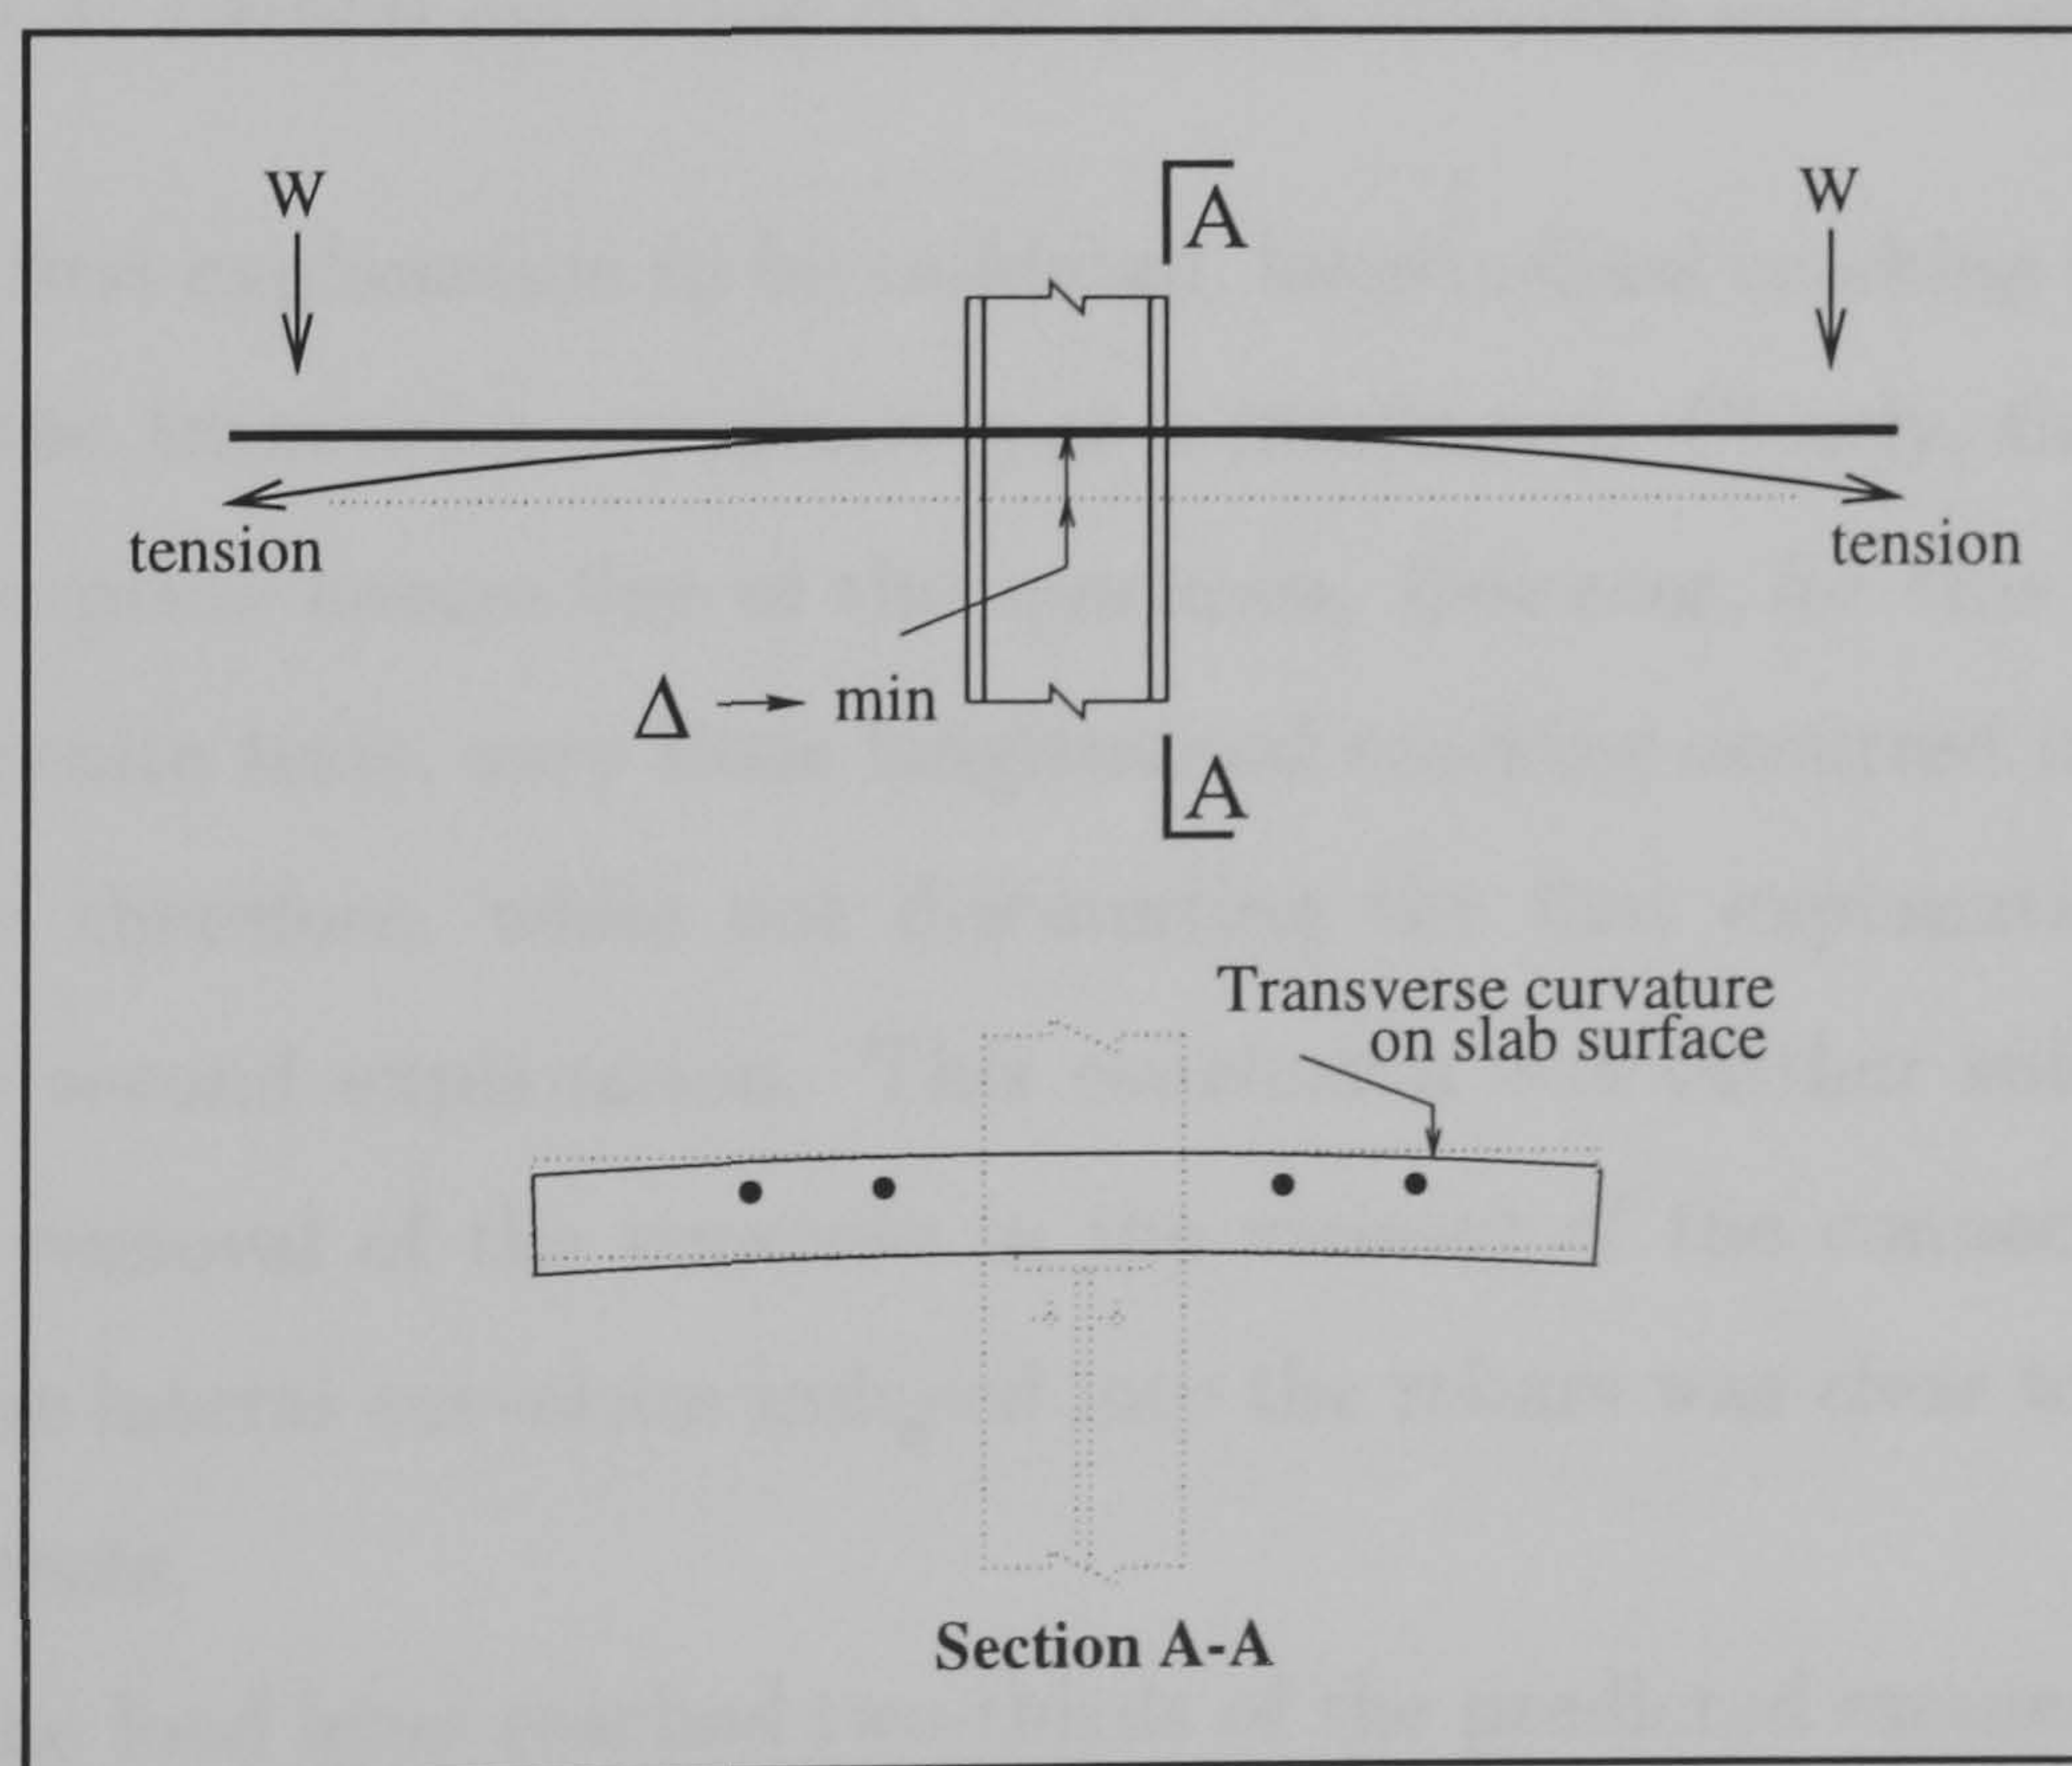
Transverse bending of the concrete slab inducing longitudinal cracking
